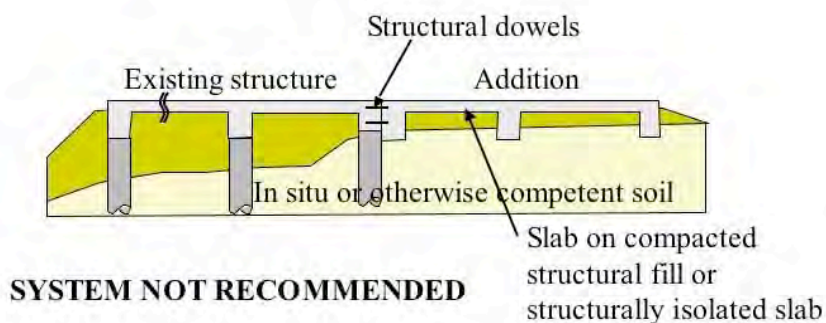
Mixed Depth System for Building Addition with Shallow Foundations
